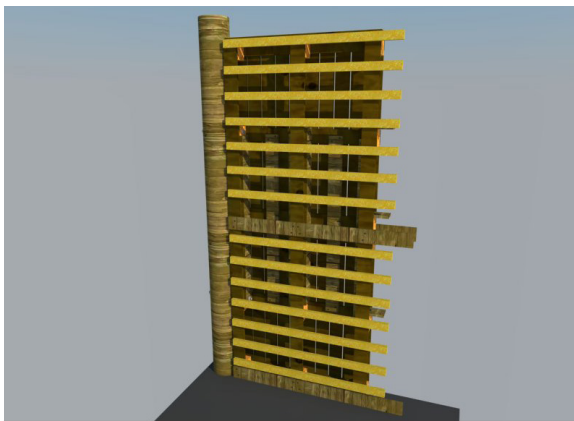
Drawing and model of the basic pallet module with filling and finishes with stabilized soil on a corner (design by Rocha-Rotondaro, PIP CONICET, 112-1635). 2013. / Croquis y maqueta del módulo básico de pallet con rellenos y terminaciones con suelos estabilizados en esquina (diseño Rocha-Rotondaro, PIP CONICET 112-1635). 2013.
